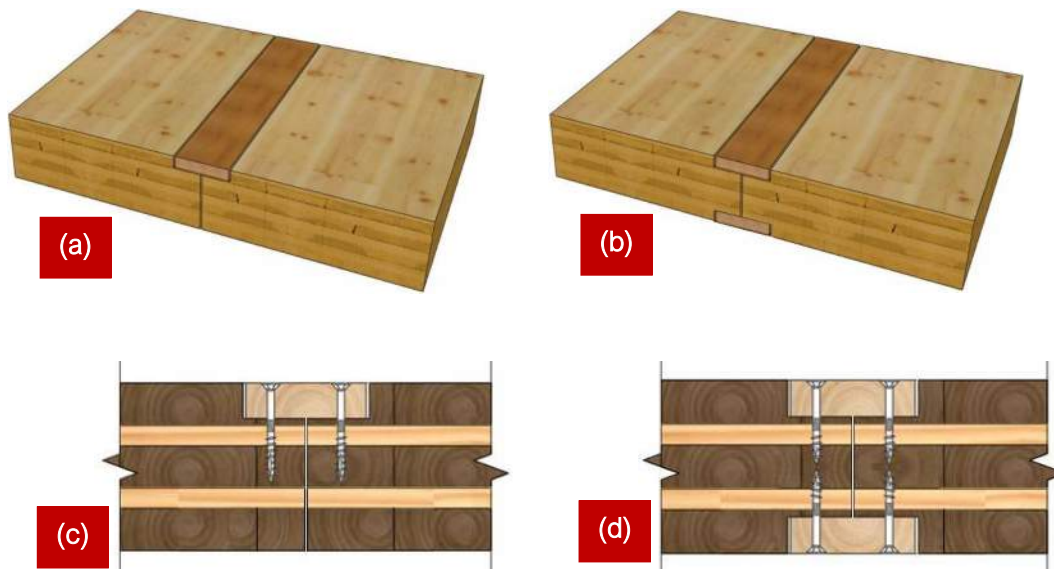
Spline Joints panel to panel connection; (a) Single spline joint; (b) Double spline joint; (c) Single spline joint screw arrangement; (d) Double spline joint screw arrangement.
